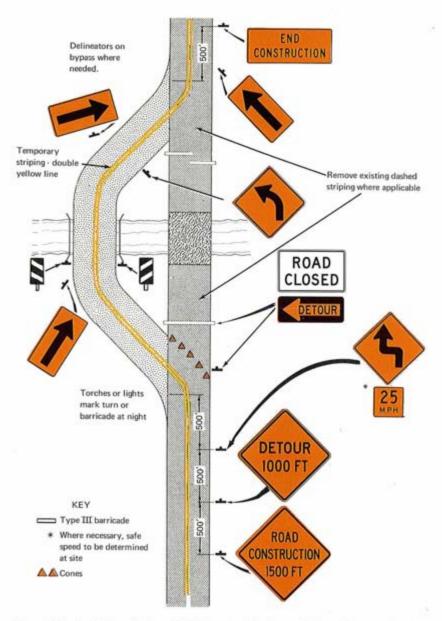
Typical applications of traffic control devices on 2-lane highway where the entire roadway is closed and a bypass detour is provided (signs shown for one direction of travel only).
